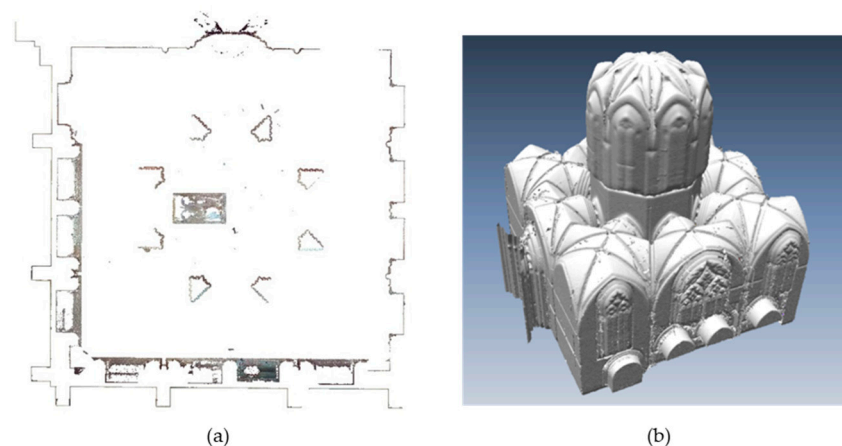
Founder's Chapel: (a) floor plan view in Autodesk Revit, (b) 3D model after indoor cloud registration.
